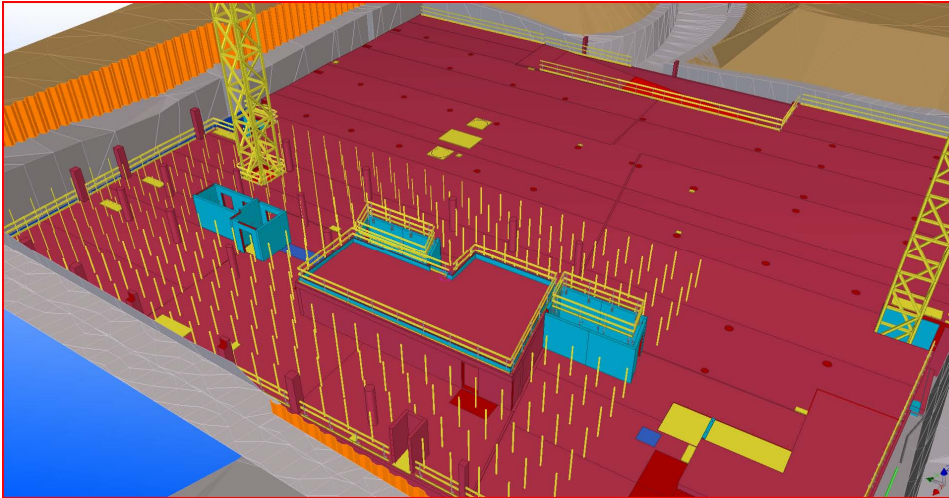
In the second phase the columns of the floor mould system are to be installed.
